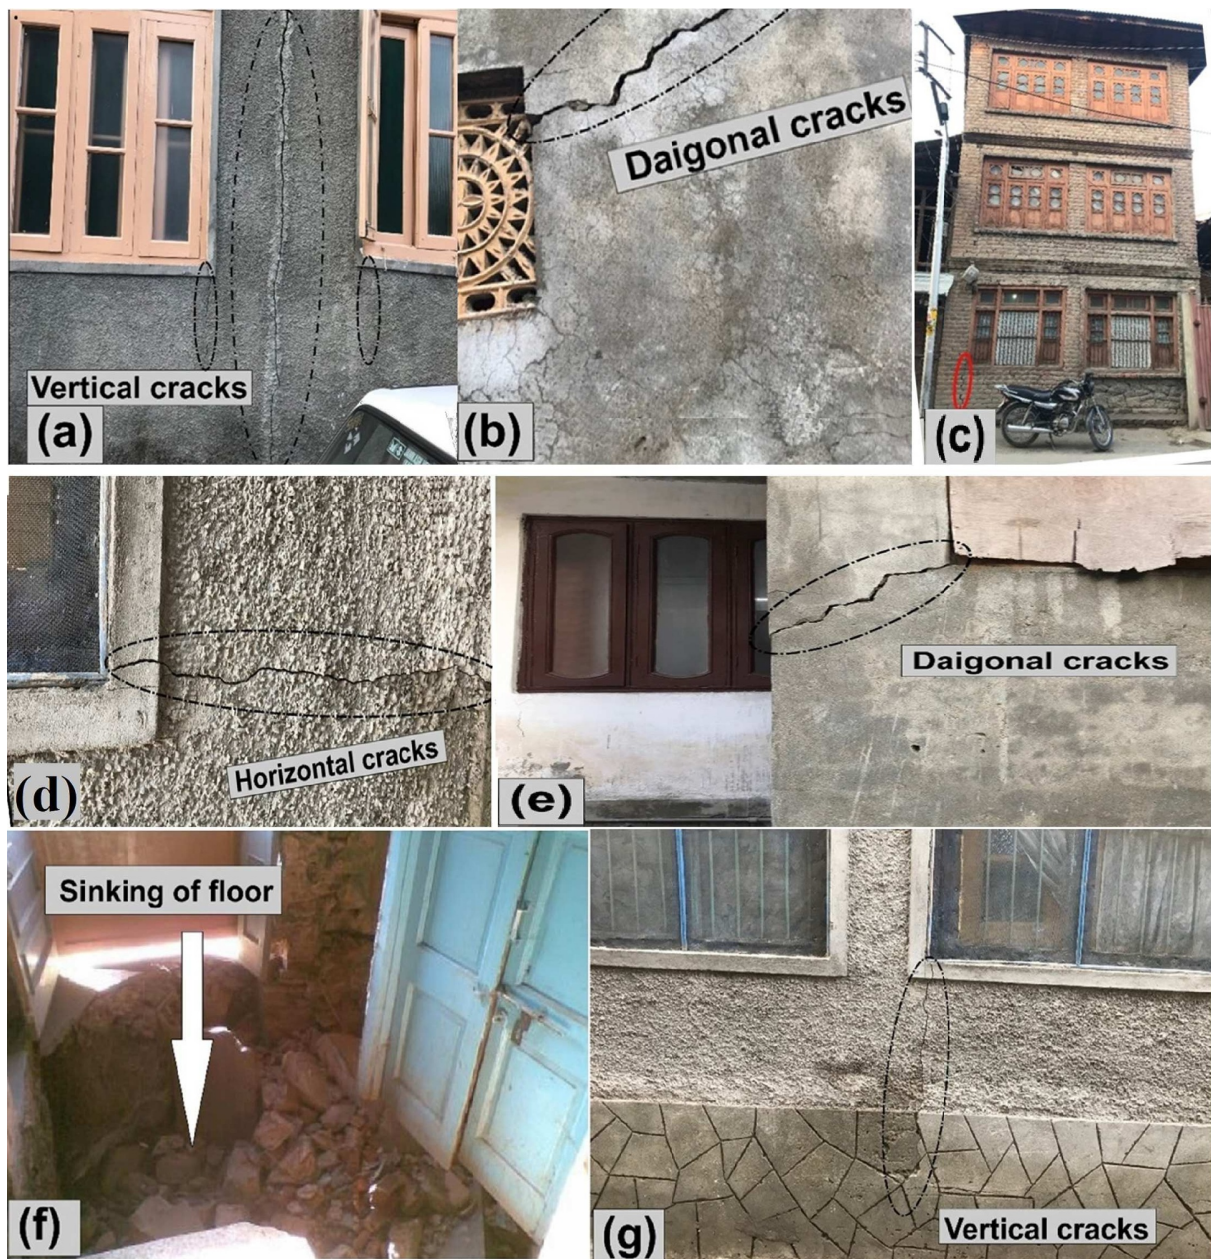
(a) Deformed wall including an upright wide tension crack at Surteng locality indicating that the foundation of this building is dropping. (b) Front view of the wall showing a large diagonal crack developed in the wall visible on both sides and extends up to the window frame. (c) A colloquial masonry structure experiencing displacement and tilting quite sharply due to impact of the subsidence (d) A horizontal crack displacing the wall and the window pane (e) Front wall shows a wide crack that appear downwards from window frame and shows displacement of the upper column with respect to the lower one. (f) Sinking of the floor near the entrance of a masonry structure due impact of the subsidence. (g) A vertical crack running downward from the window and tapers at the foundation level.
